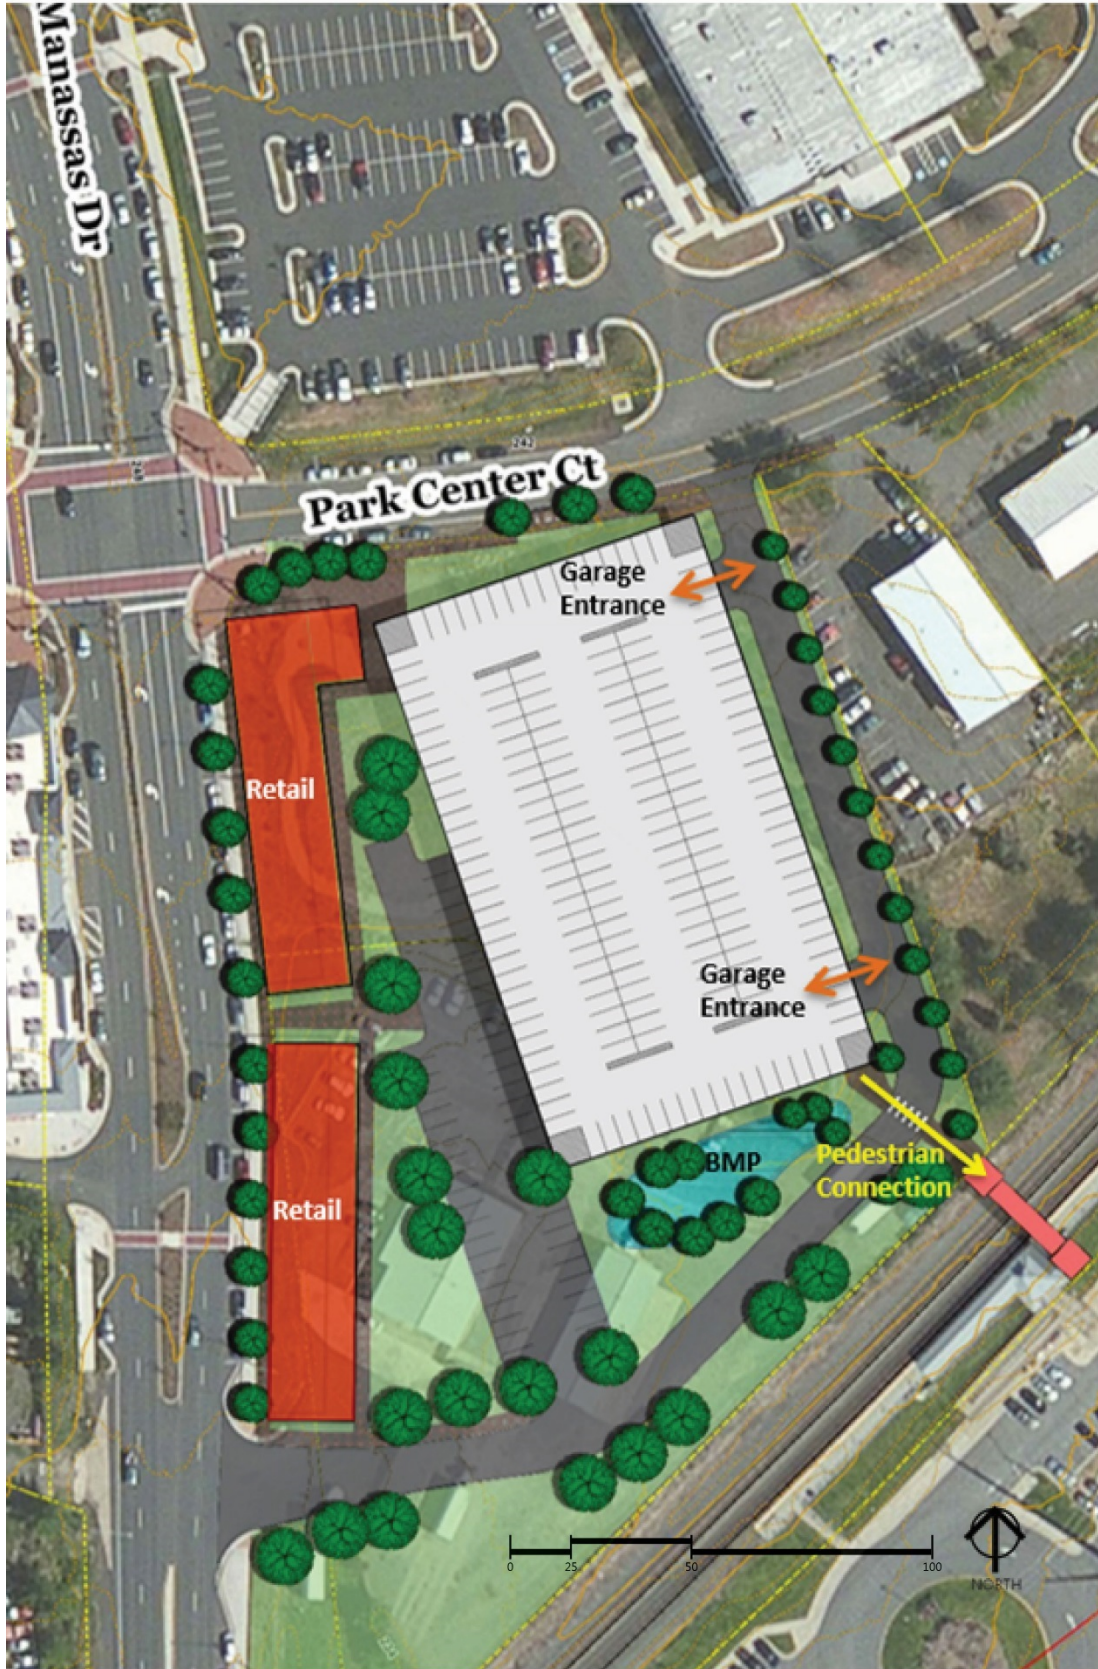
Millicent and Truck Driving School Site Parking Structure Concept
